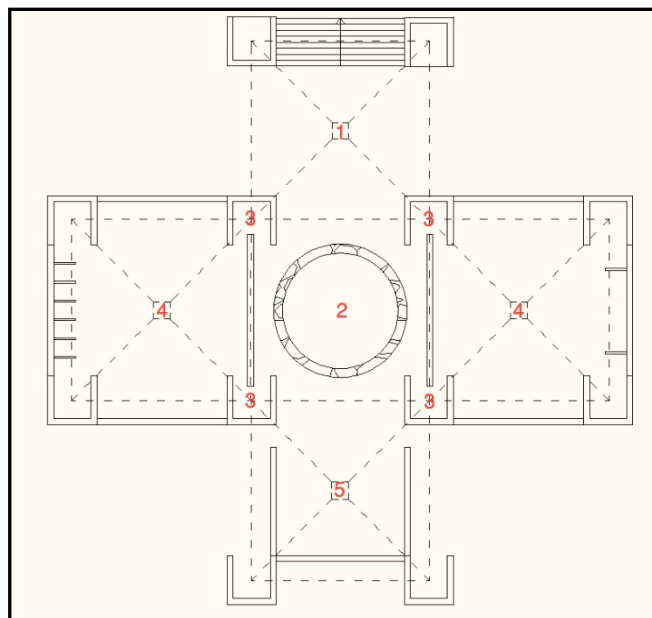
The Bath House, Ground Floor Plan (Re-drawn by Author)
